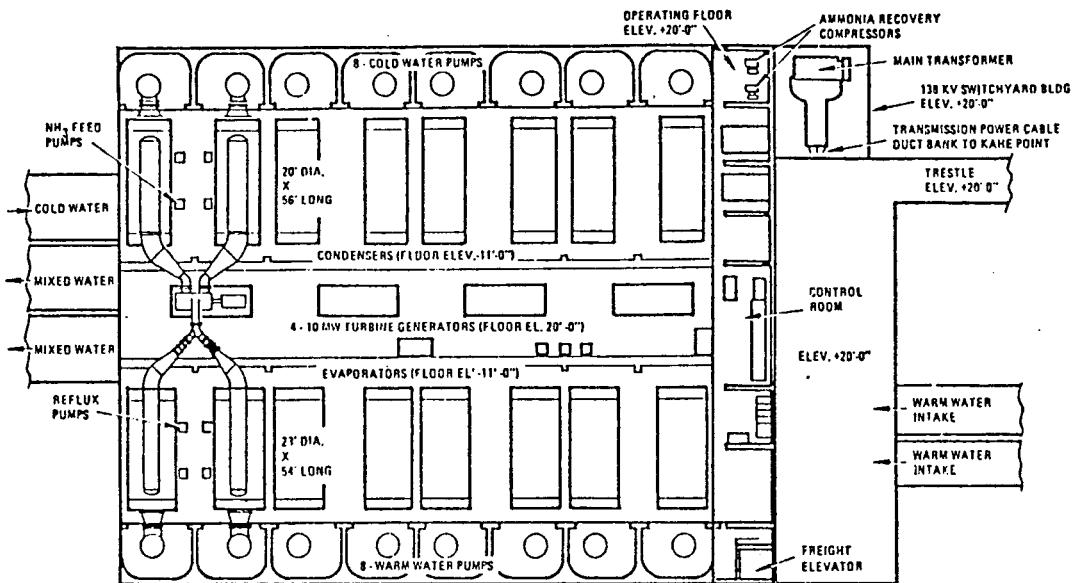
Plan view of 40 MW_e OTEC power plant.
